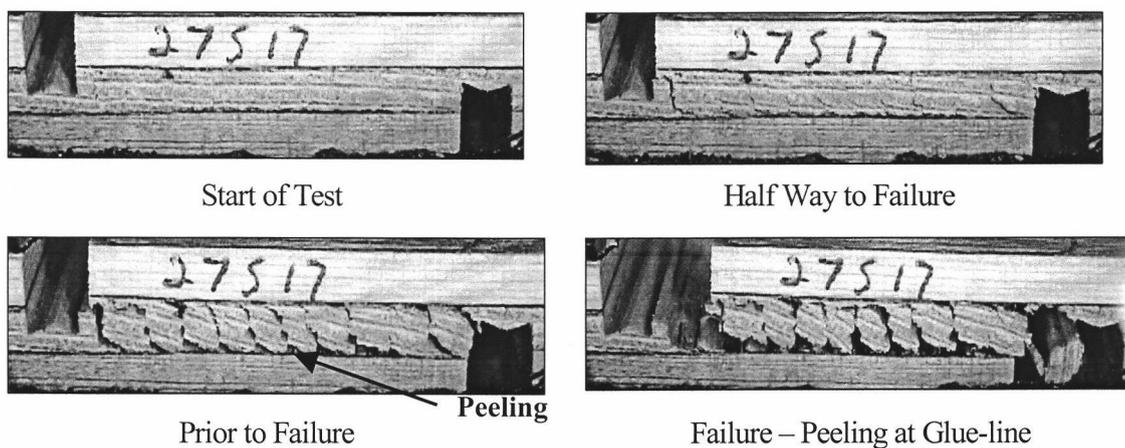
Failure in the loose-side glue-line due to bending and peeling forces causing rotation of the wood material between lathe checks.
